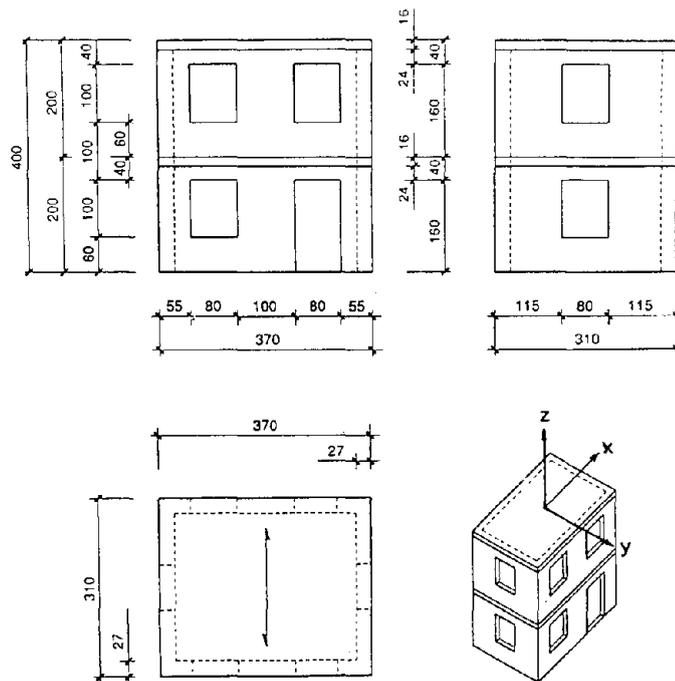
Main geometrical features of the tested masonry building prototypes (lengths in cm).
